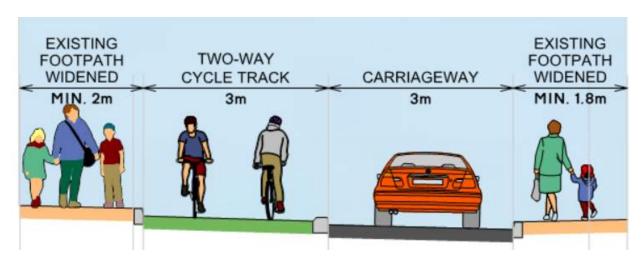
Typical Section 4 Option A Cross Section SCR - Two Way Cycle Track with parking between Laurel Hill Ave and Henry St
